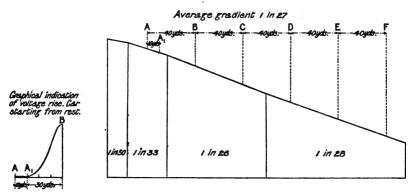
Longitudinal Section of Easy Gradient for Coasting Tests.
